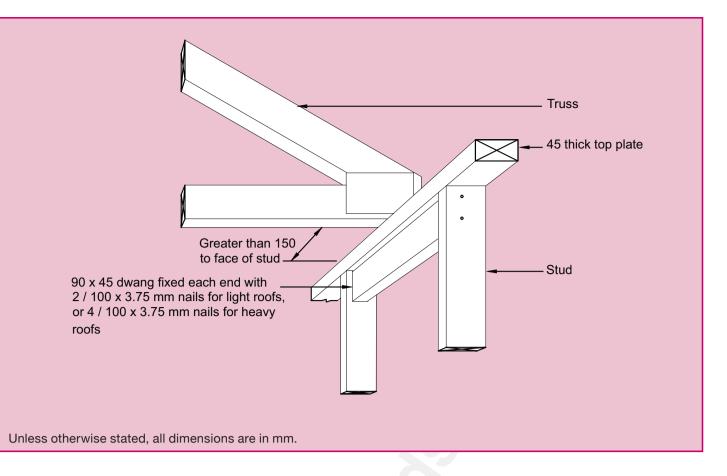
Strengthening top plate (see 8.7.1.1 and table 8.16)
